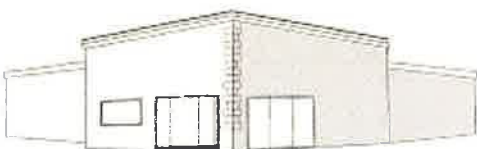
NO. Building design that does not include details to scale down entrances, roofs or wall size, and does not reflect Vermont's historic, rural architecture does little to complement a scenic rural landscape.
